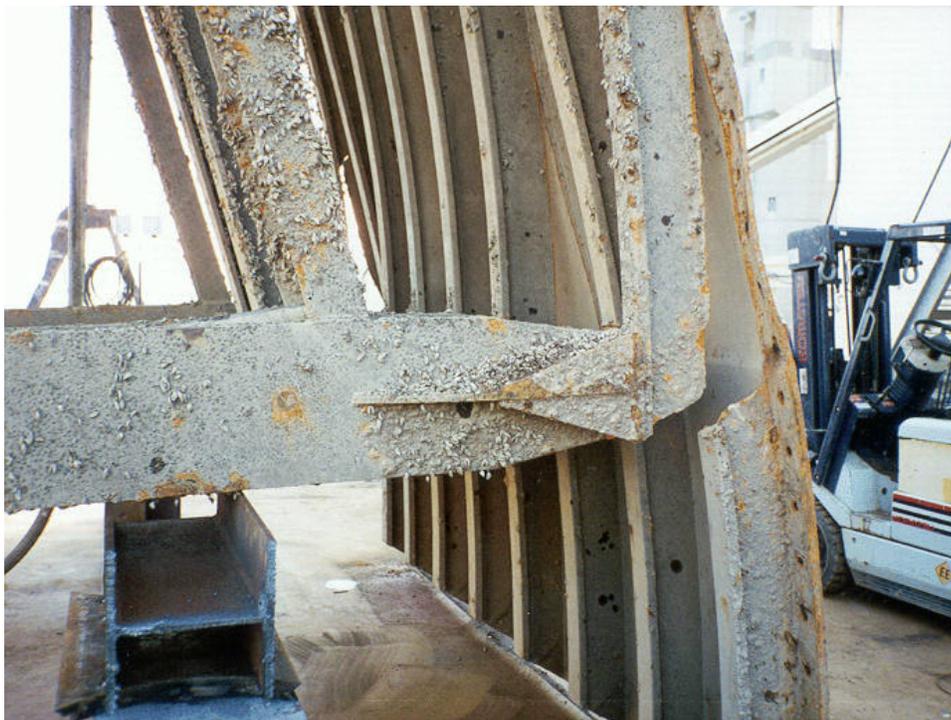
Side view of failed Smithland valve. Note sheared rib at strut arm and offset of curved ribs above and below horizontal girder
